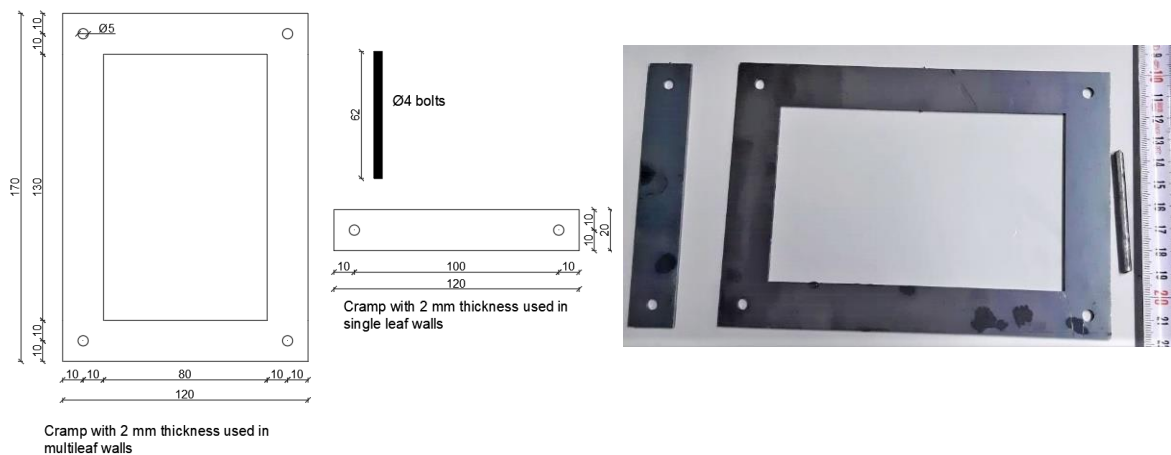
Details of cramps used in single- and multi-leaf walls (units are in mm).
